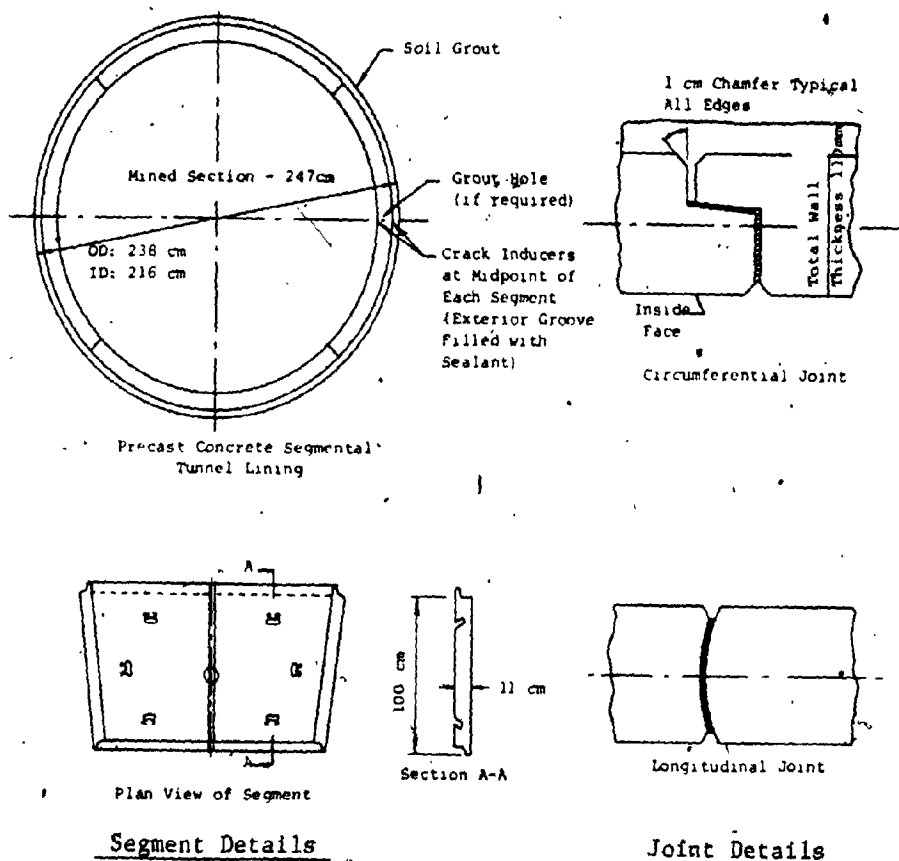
Details of Tunnel Liner (after Morton et al., 1977)
